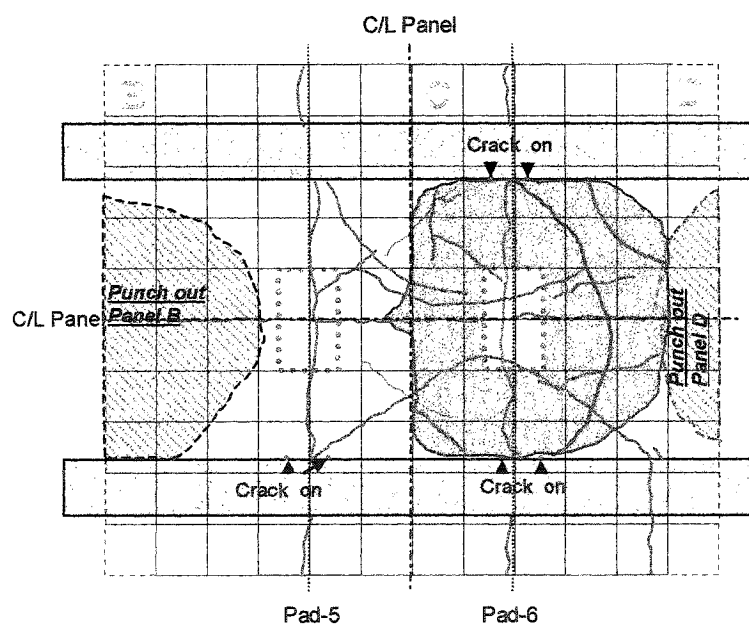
Panel-C: Crack Patterns on Soffit after Failure
